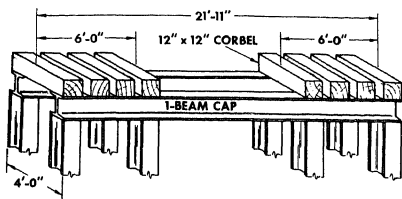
Construction of pile caps to provide seating for bearings at adjacent ends of independent spans—steel piles and caps.
